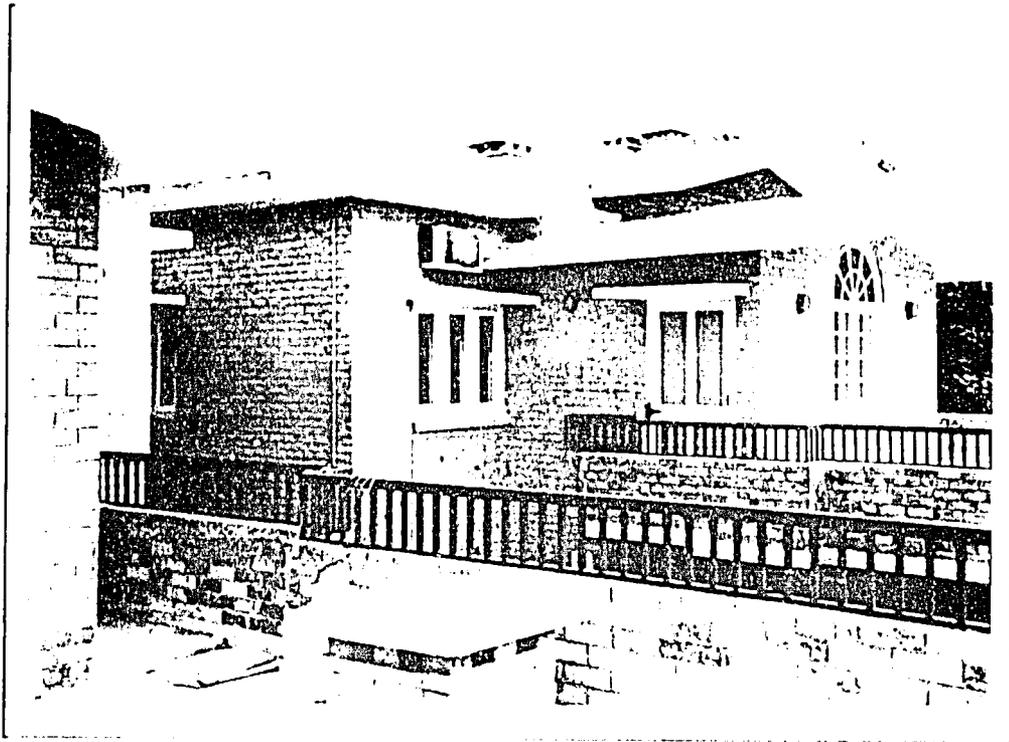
Peshawar CCSC Headquarters Building. View of Building #3 from Building #4.
